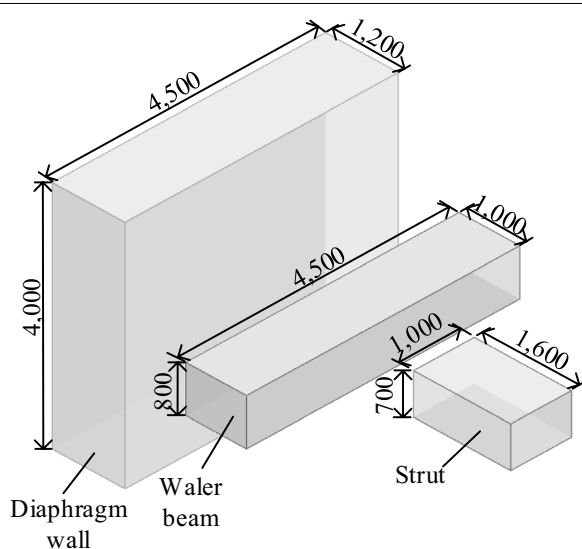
Configuration of the wall-beam-strut joint (unit: mm).
